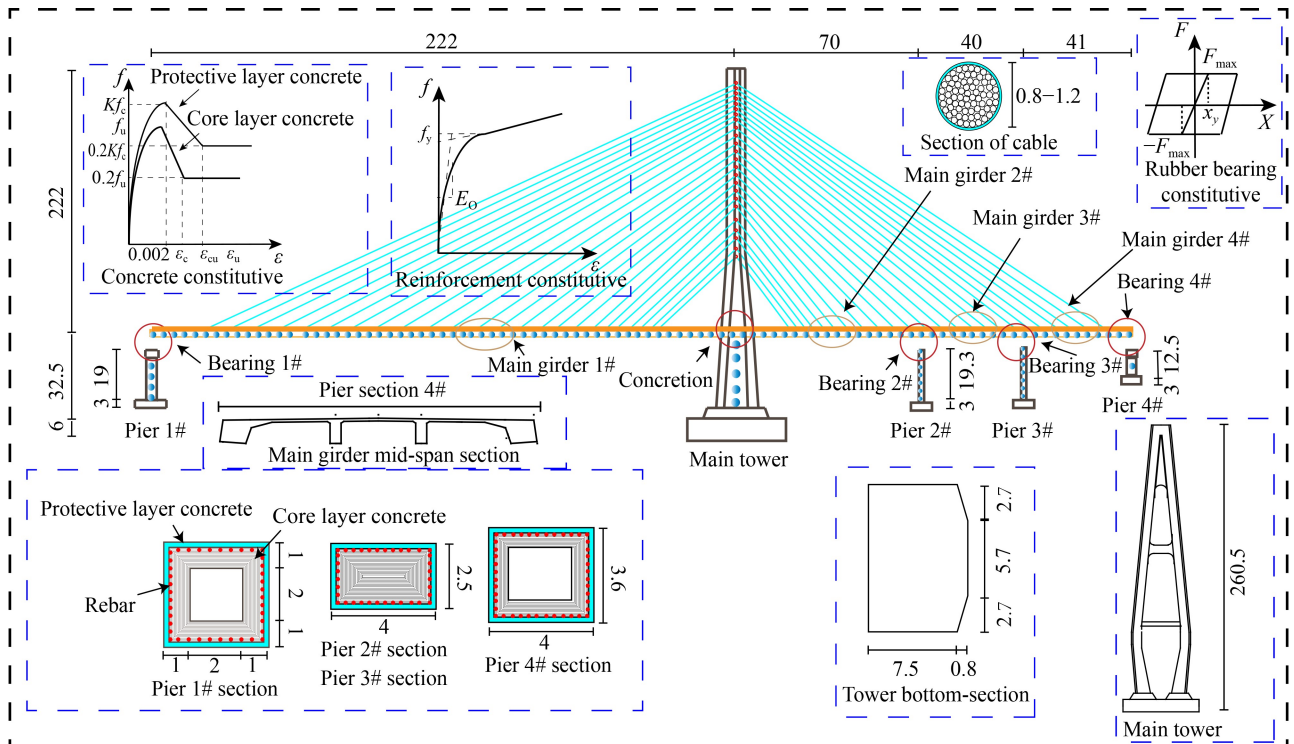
The layout of single-tower cable-stayed bridge (unit: mm). (Note: Define pier 1# and pier 4# as side piers, pier 2# and pier 3# as center piers.)
